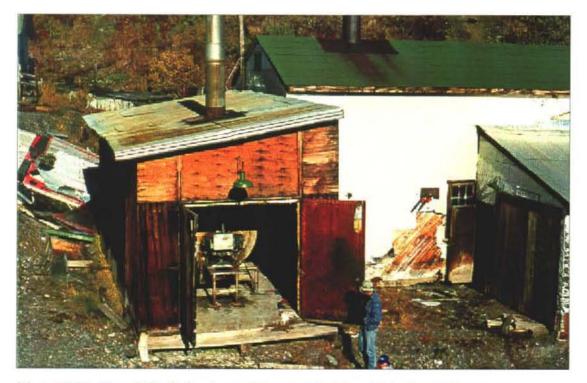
Keno 700. Boiler shack / filter plant (building 12) looking N.E.
